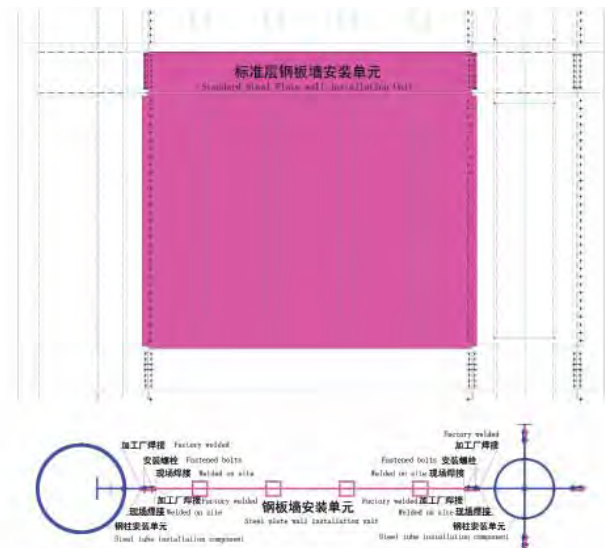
Unit division of steel plate wall at typical floor (source: Yang Yaohui Gao Junfeng & Wang Jing)
